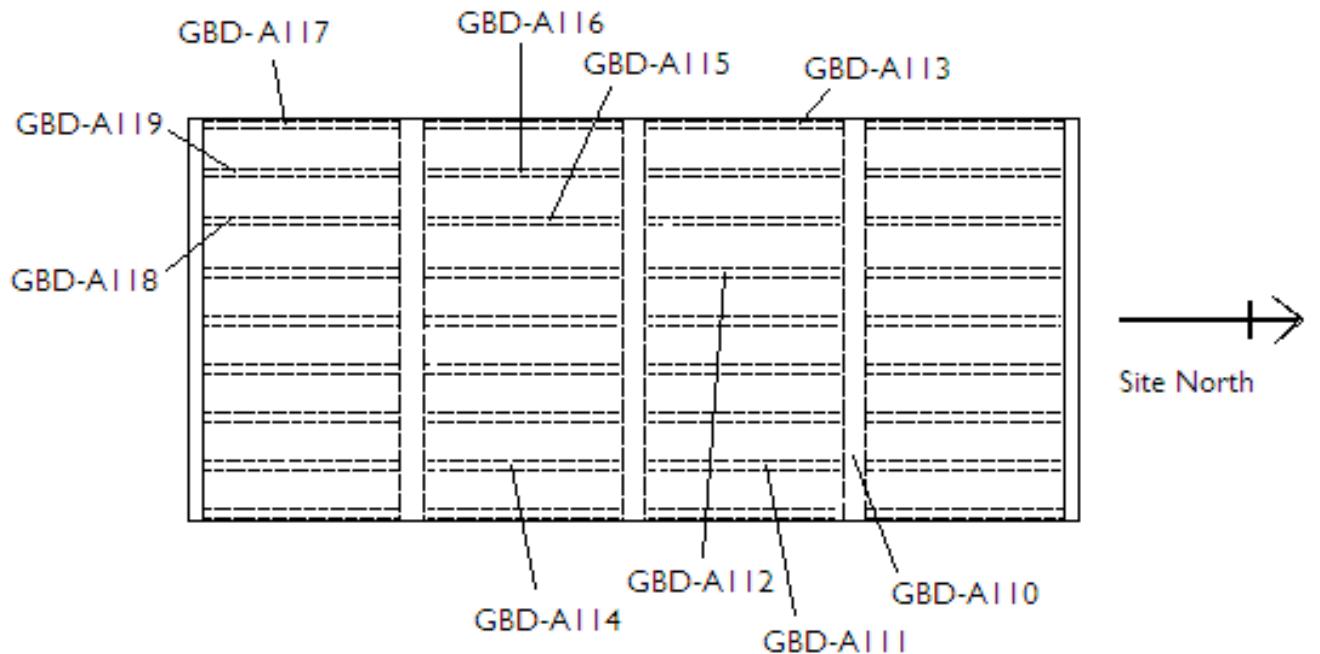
Stable; sketch plan of first-floor frame, showing the location of samples GBD-A110–19
